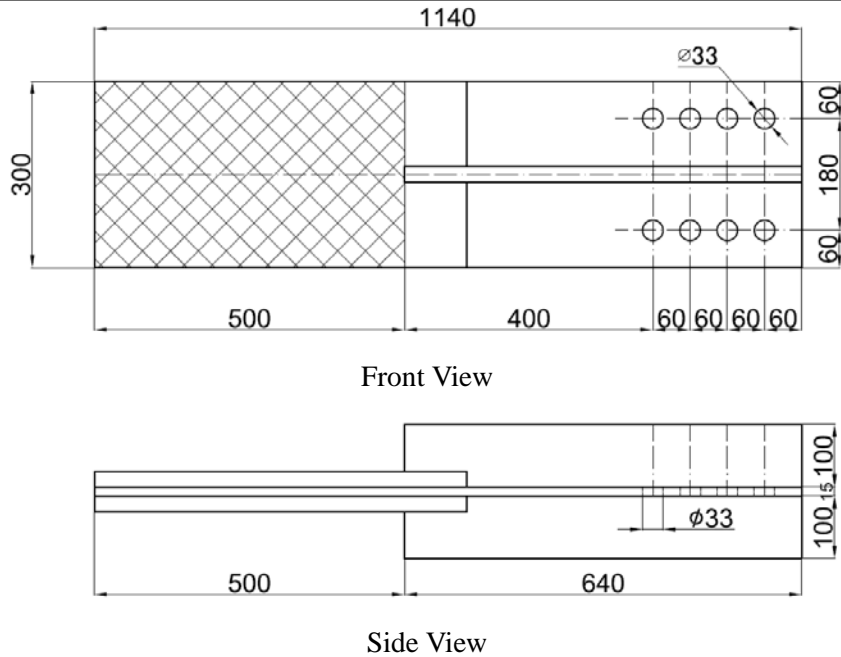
Typical Specimen with 16 Bolts in Test Seires II
